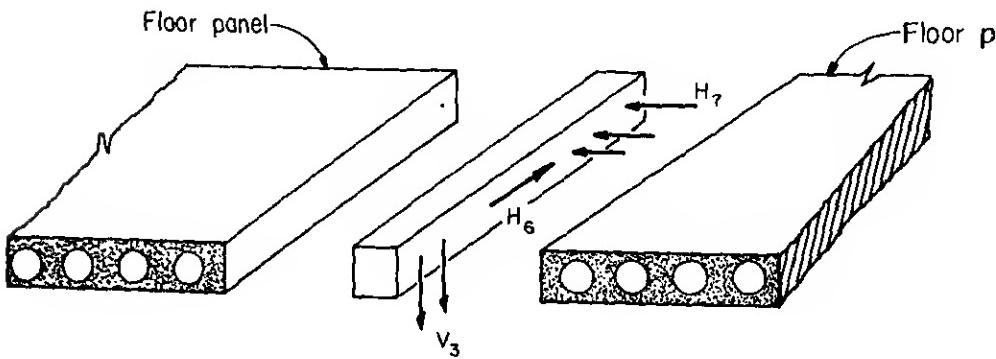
Exploded View of the Horizontal Connection Between Floor Panels and the Various Connection Forces
